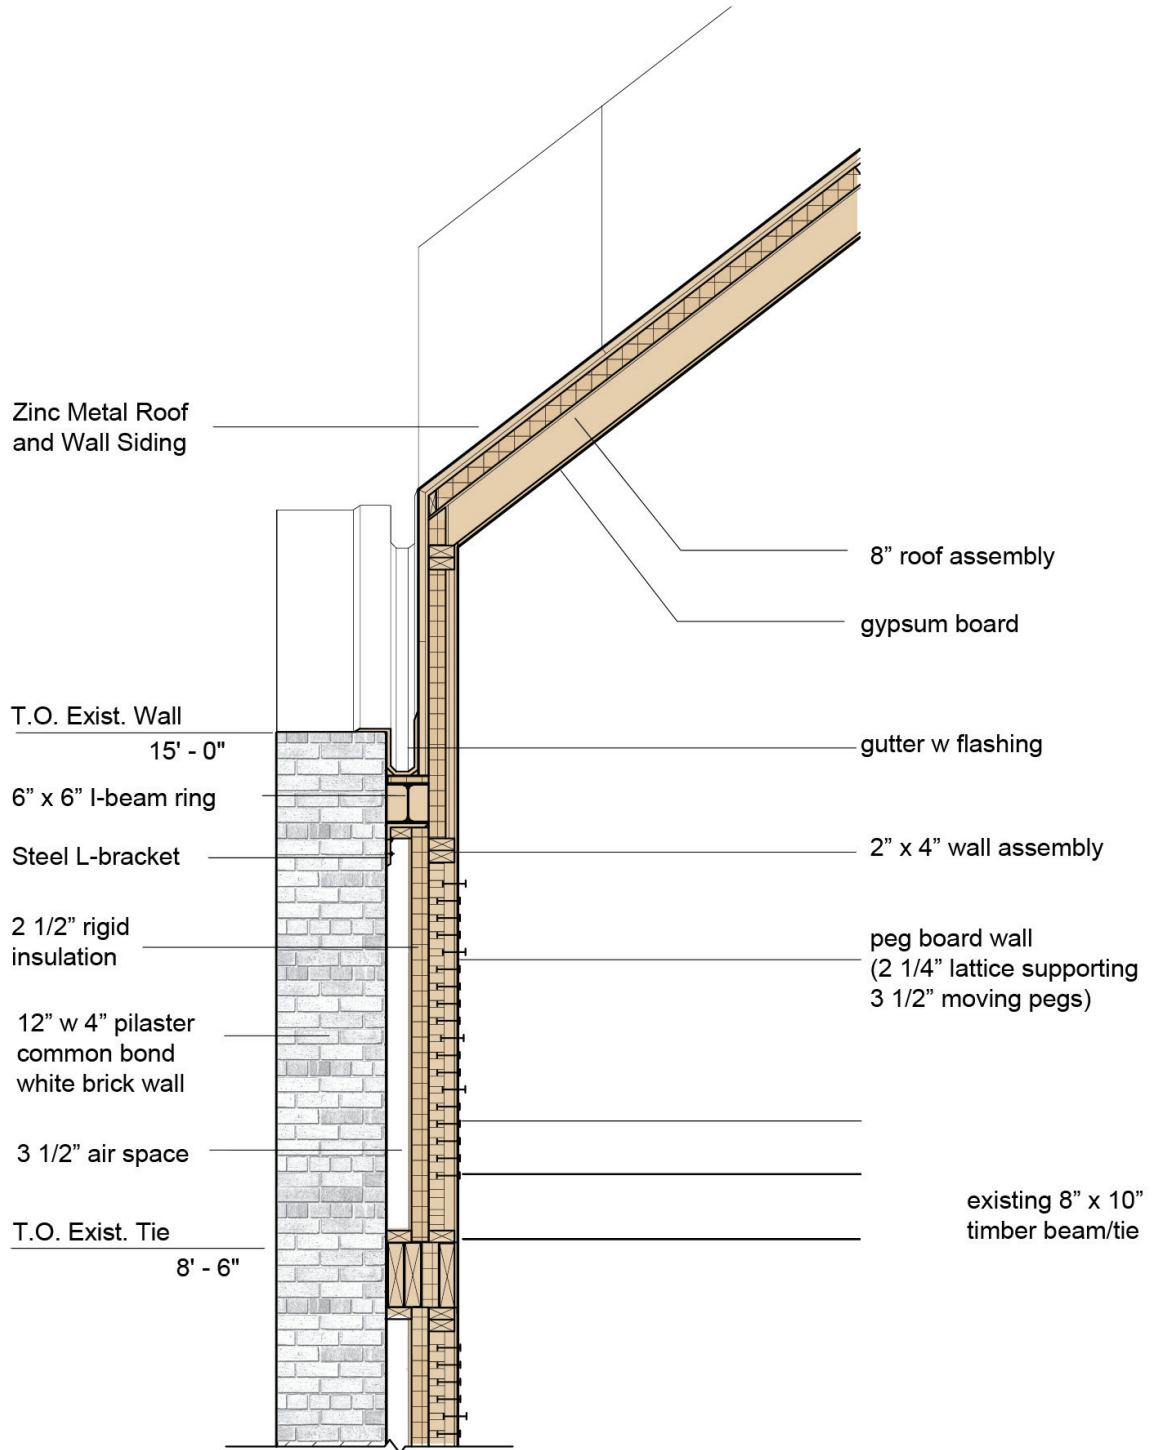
Section axonometric detail through recreation hub where the old brick wall meets the new structure.
